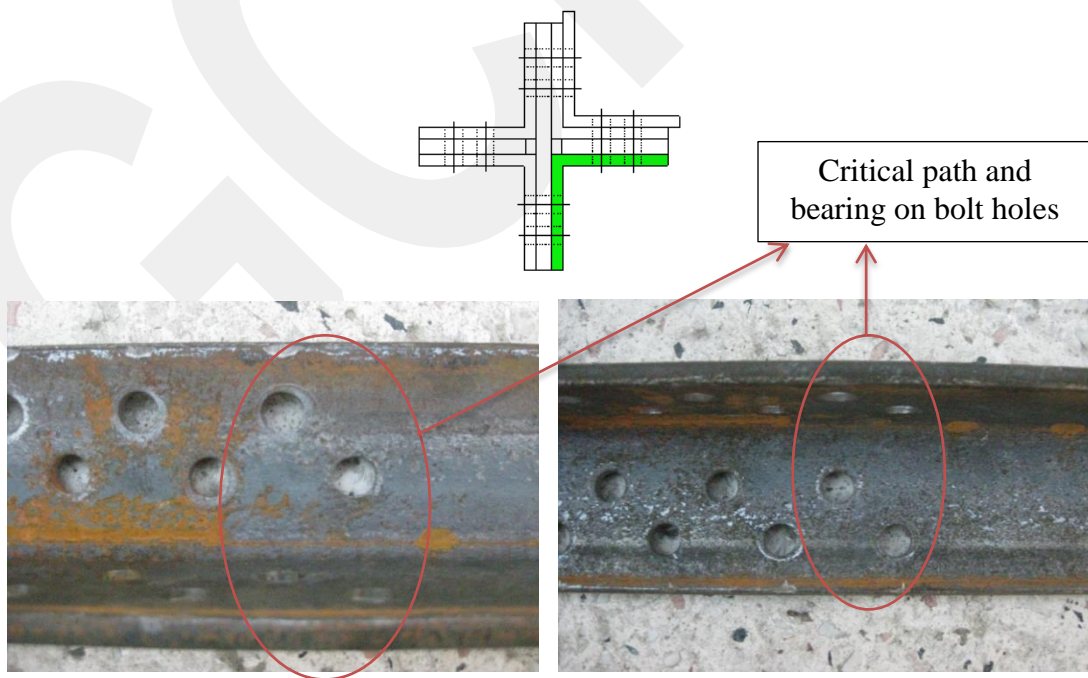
Bearing on lower main member 2 (Specimen-2)
